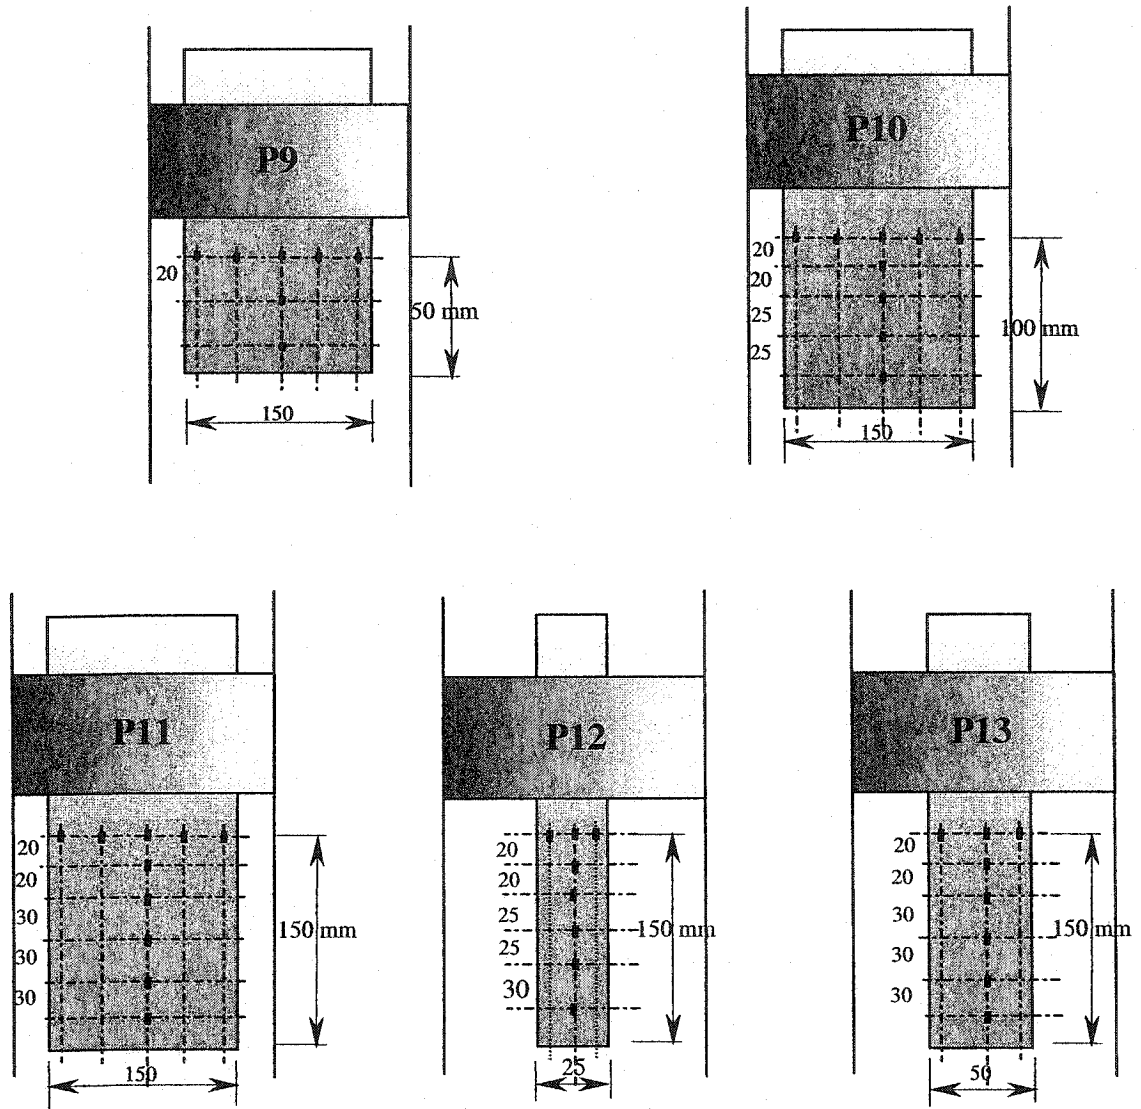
Strain gauge locations and sheet dimensions for specimens P9 to P13
